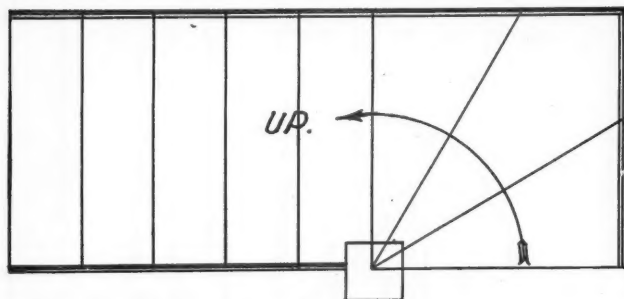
A Typical Floor Plan with Triple Lines Representing the Position of Stringers and Light Lines the Face of Risers.
